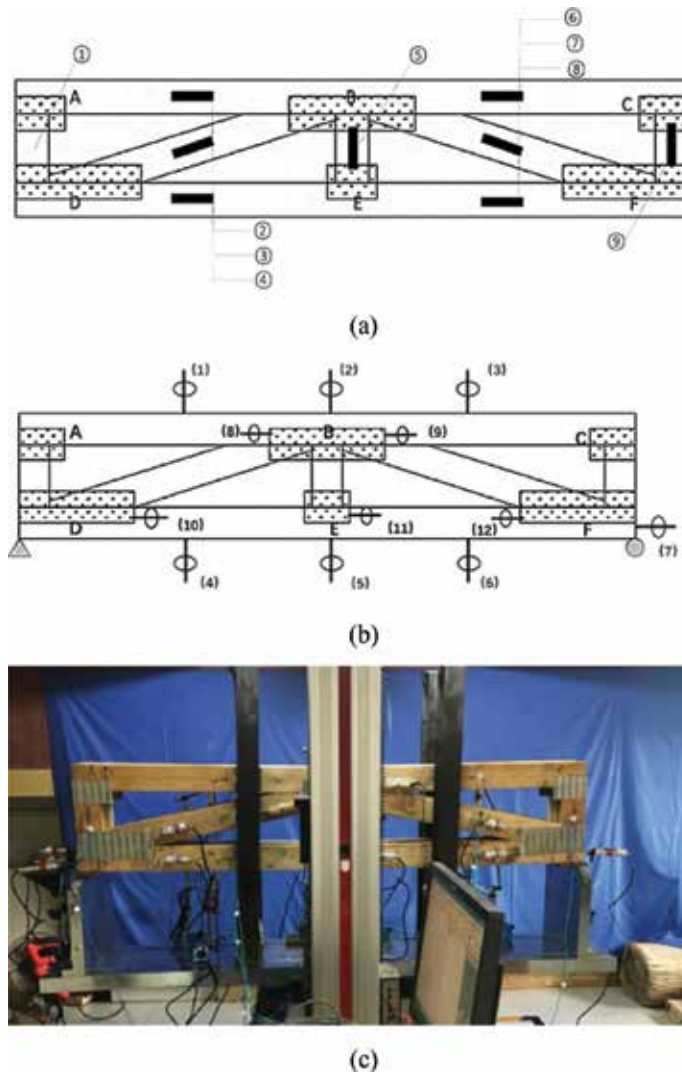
Layout of strain gauges and displacement gauges. (a) Layout of strain gauge; (b) displacement gauge; (c) universal mechanical testing machine.
